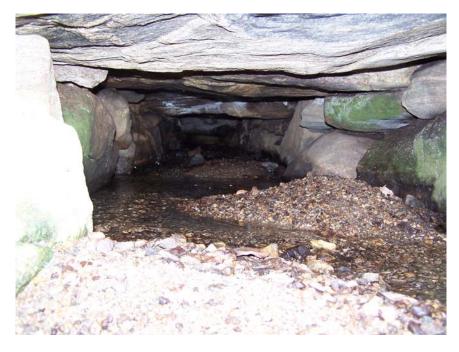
View southwest through stone culvert passing underground parallel to adjacent stream.
